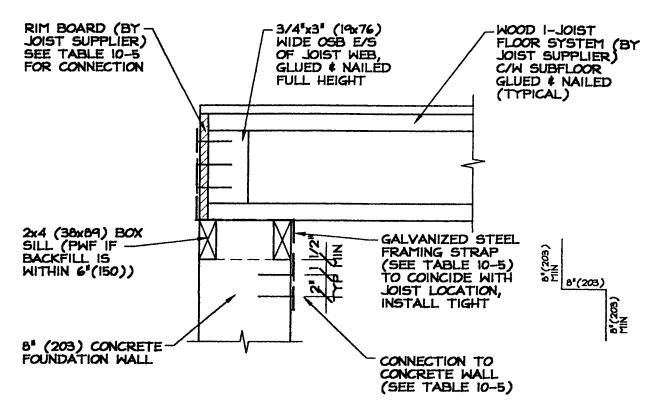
A - LATERAL BRACING, SIDEWALL CONDITION (WOOD I-JOIST SYSTEM)
